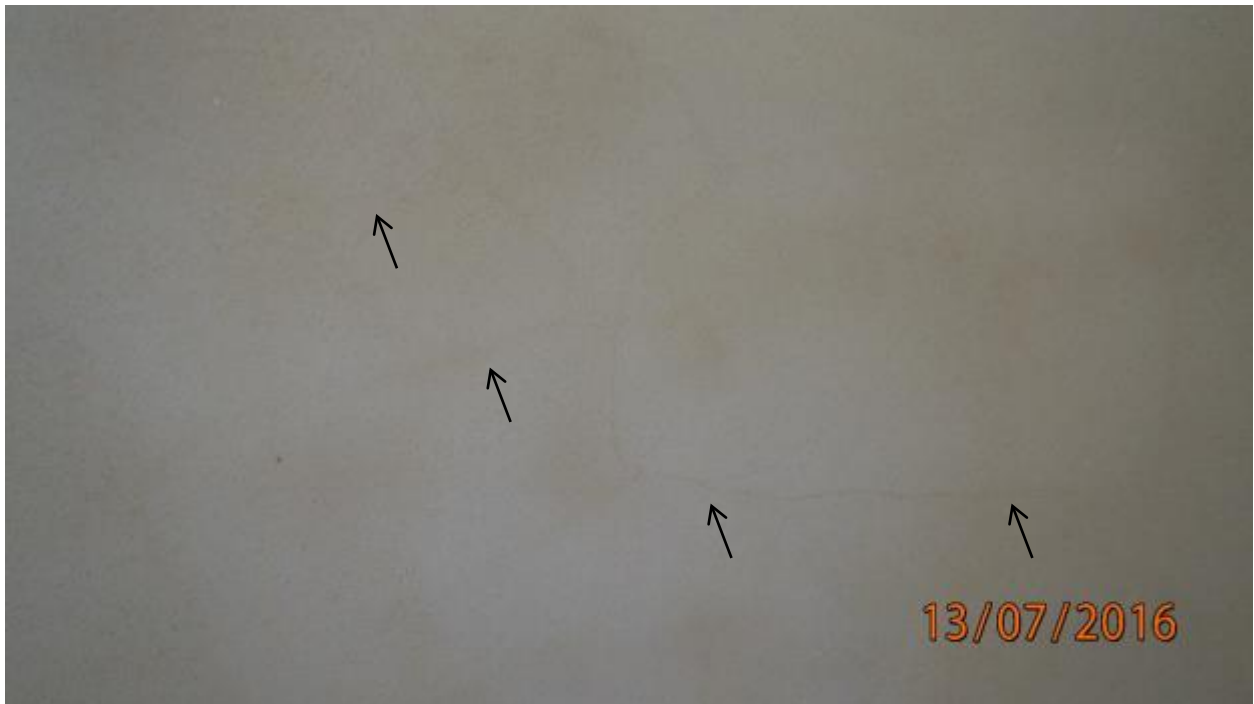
shows horizontal and radial cracking to the left outside Bedroom 1 window.
